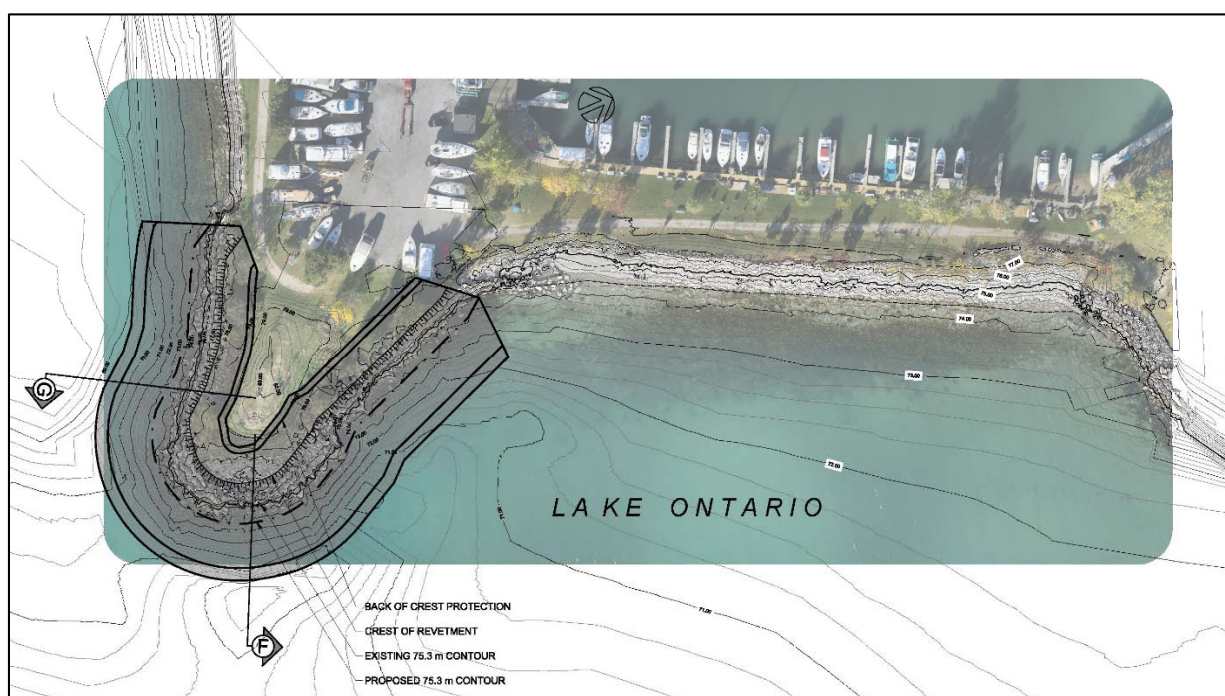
Concept design plan view for Option 1B, headland reconstruction. *Source: Shoreplan Engineering, 2017.
